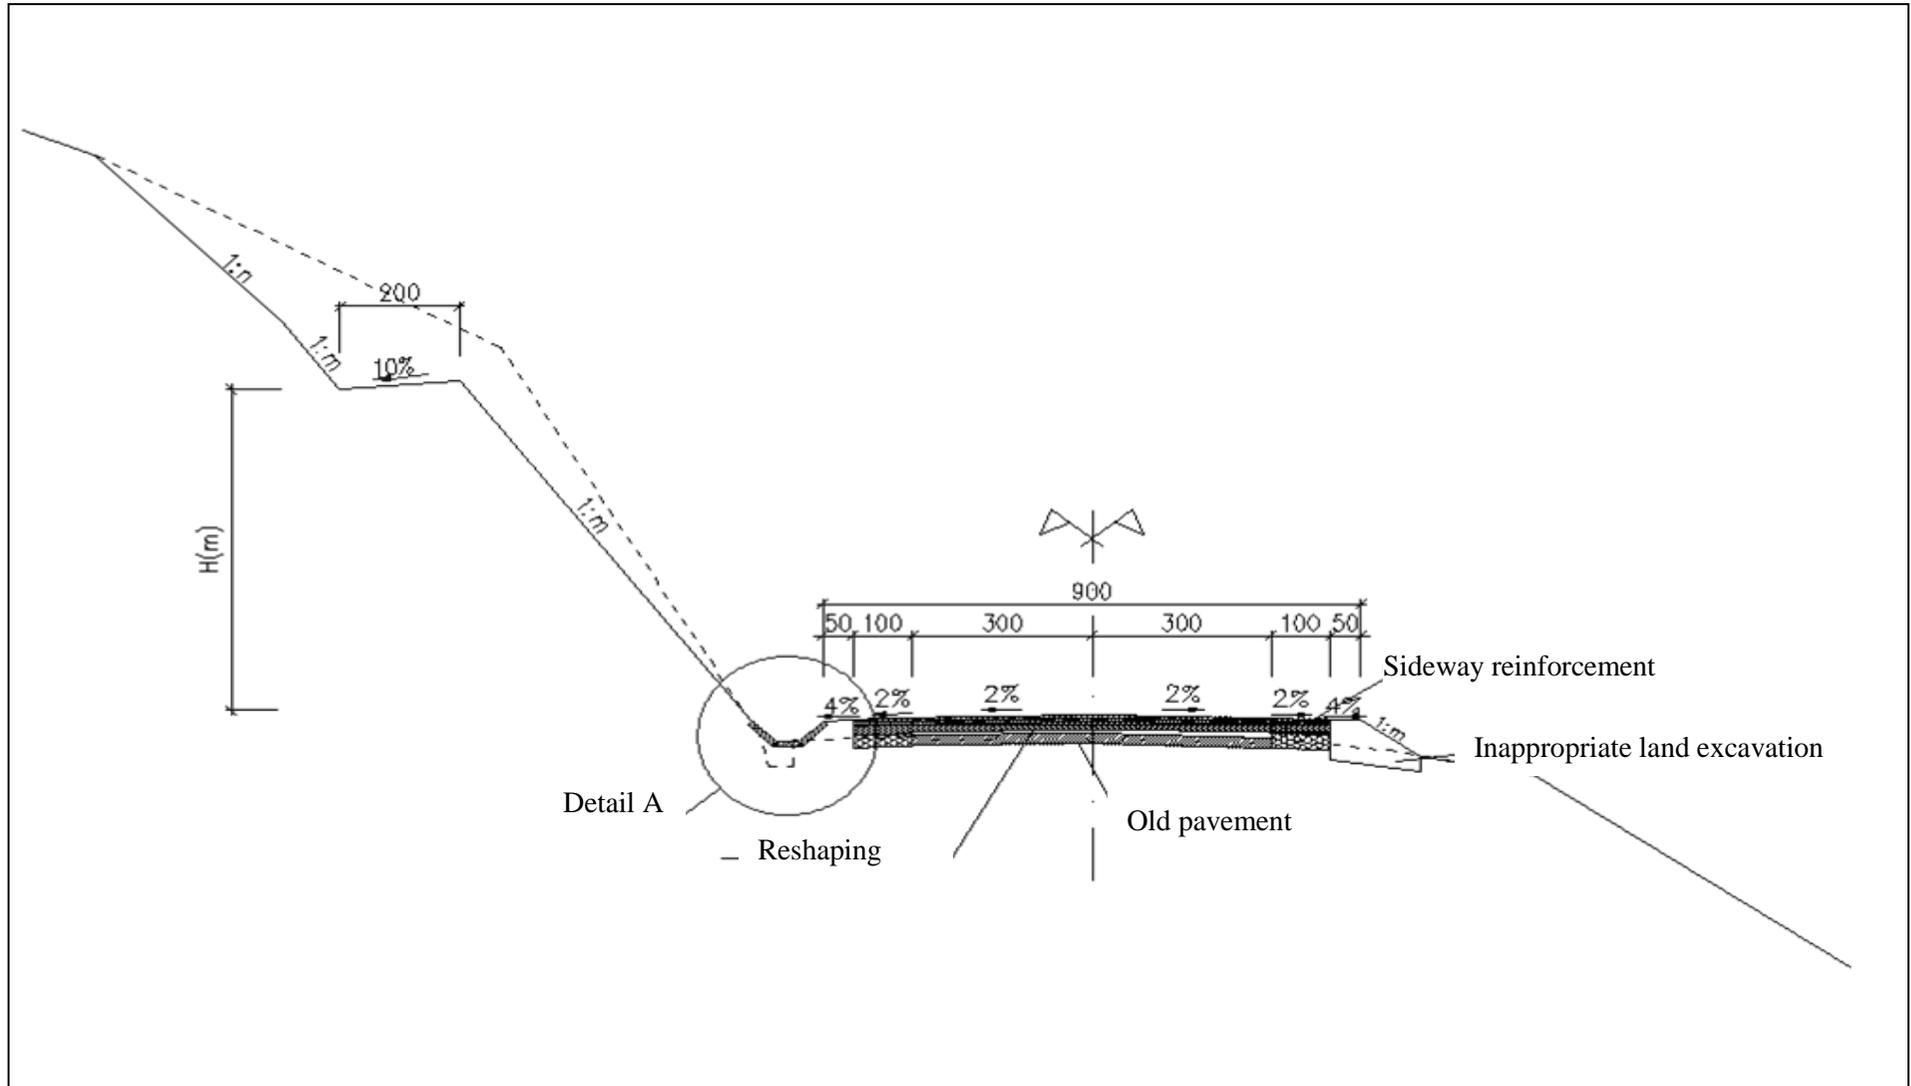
Typical cross section of road section with mountainous area scale III ($B_n = 9$ m, $B_m = 6$ m)
